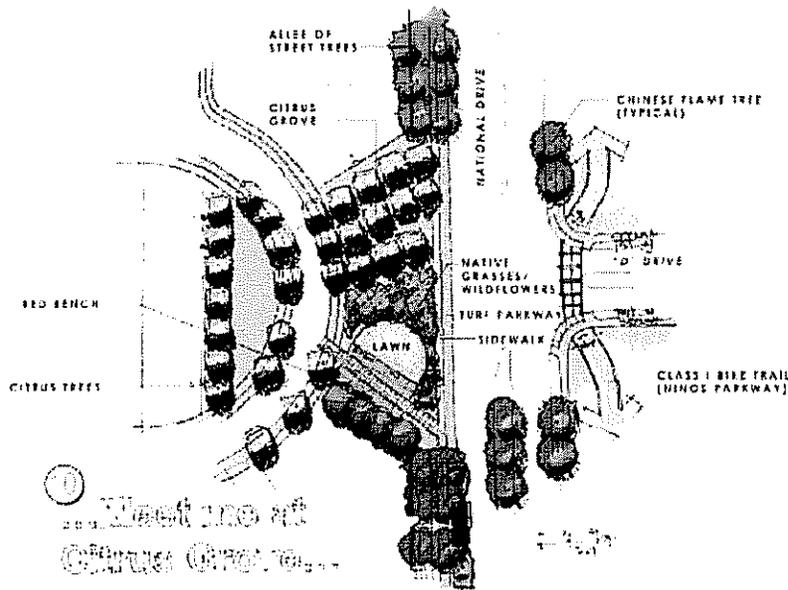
Schematic Landscape Plan 10. Citrus Grove.
